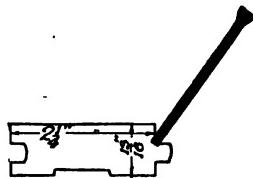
Eightpenny Cut-Steel Nail for  $1\frac{1}{16}$ -Inch Flooring.
